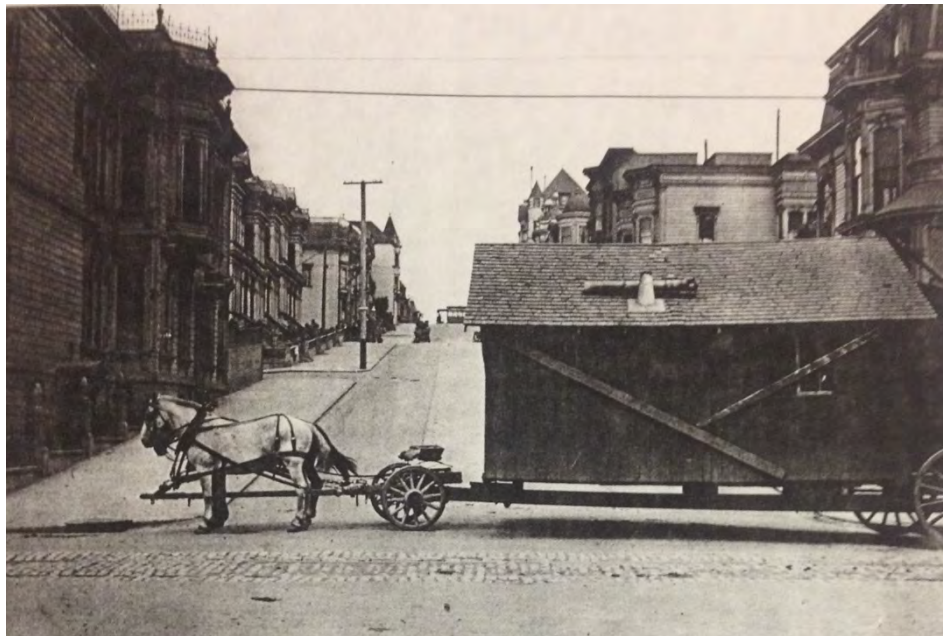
An earthquake shack in route to its new location with cross-bracing to prevent collapse. (Source: *Tiny Houses*)
